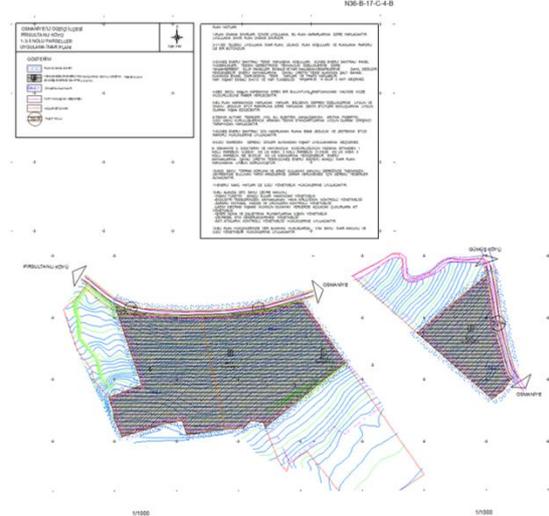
The Master building plan of parcels 1,3,5 in Pirsultanlı village
